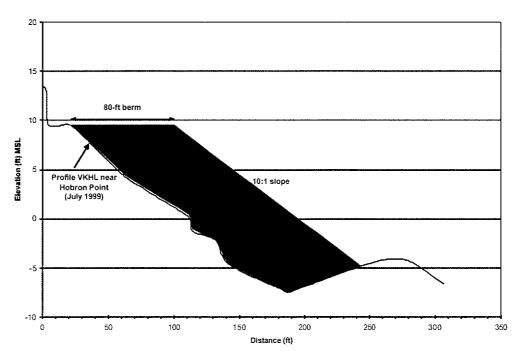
Alt. 1A and 1B - Cross-section of beach nourishment at the WWRF site.
